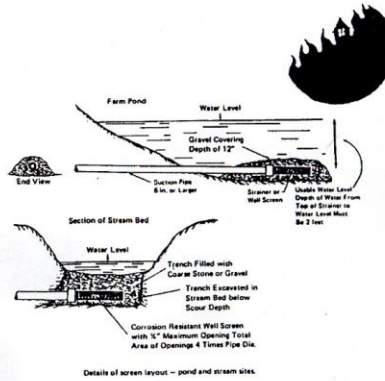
(c) Details of screen layout - pond and stream sites.
